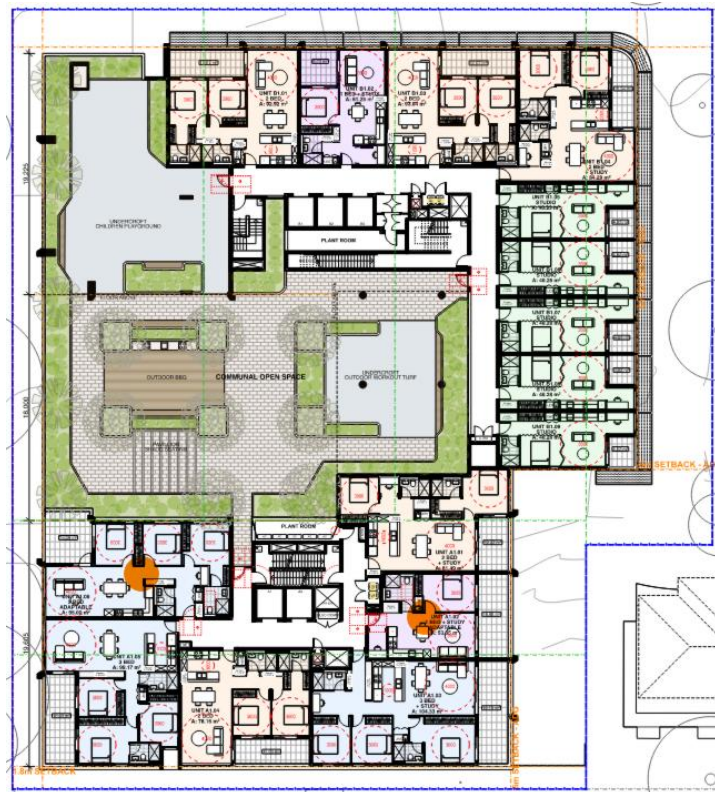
First Floor Adaptable Units Location on Architectural Plans
